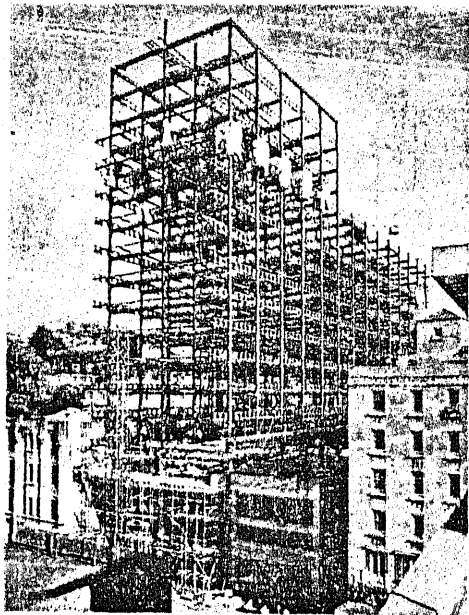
THE BUILDING DURING CONSTRUCTION
